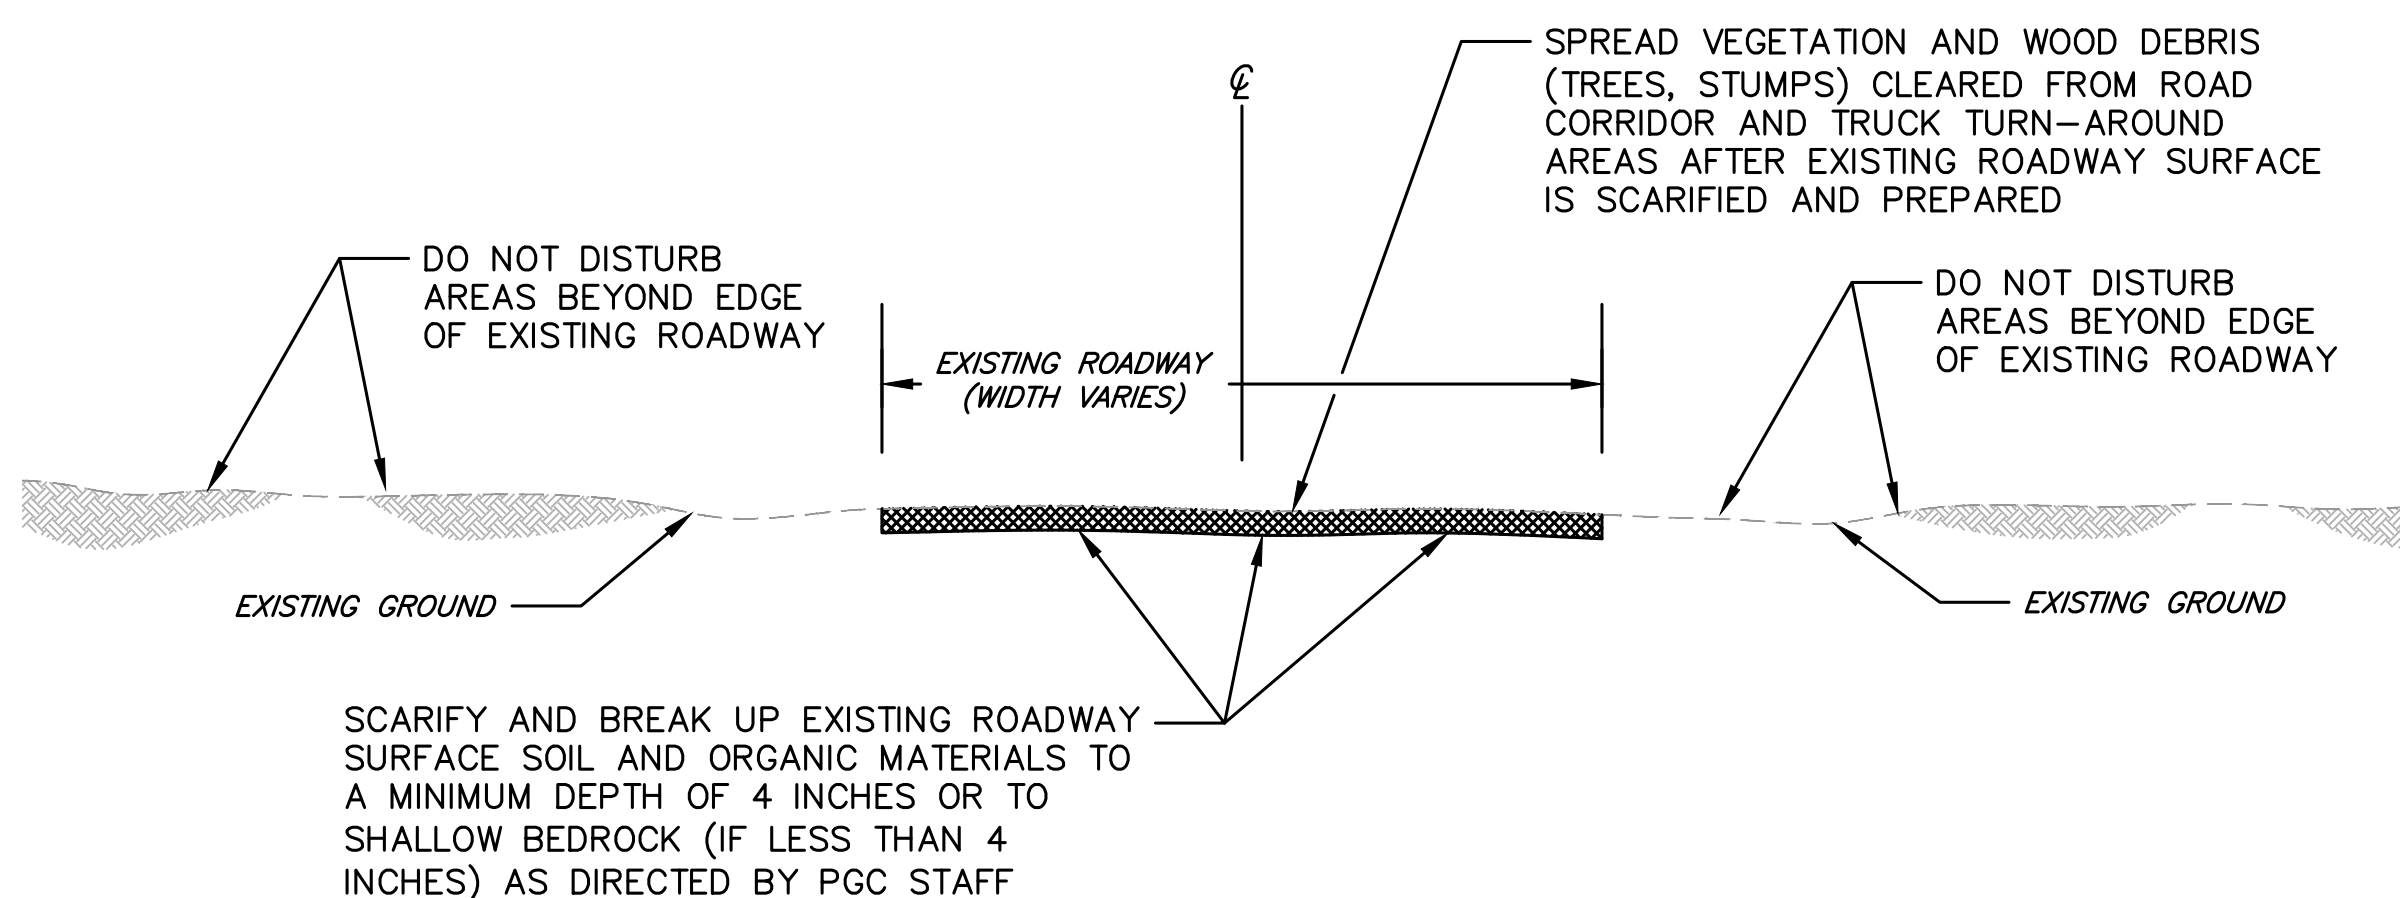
TYPICAL ROADWAY SECTION - SEGMENTS 1, 3, 5, 7, 9
